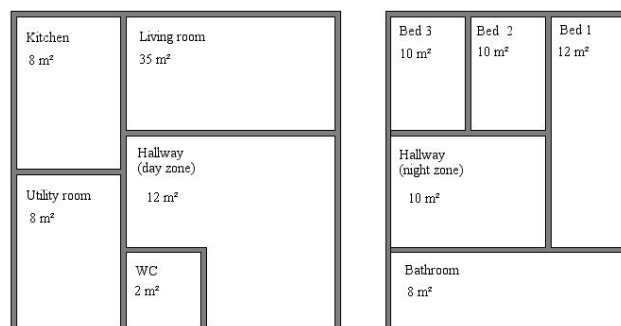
the two-storey dwelling, with the day zone downstairs and the night zone upstairs, is the second reference dwelling used in this study.
